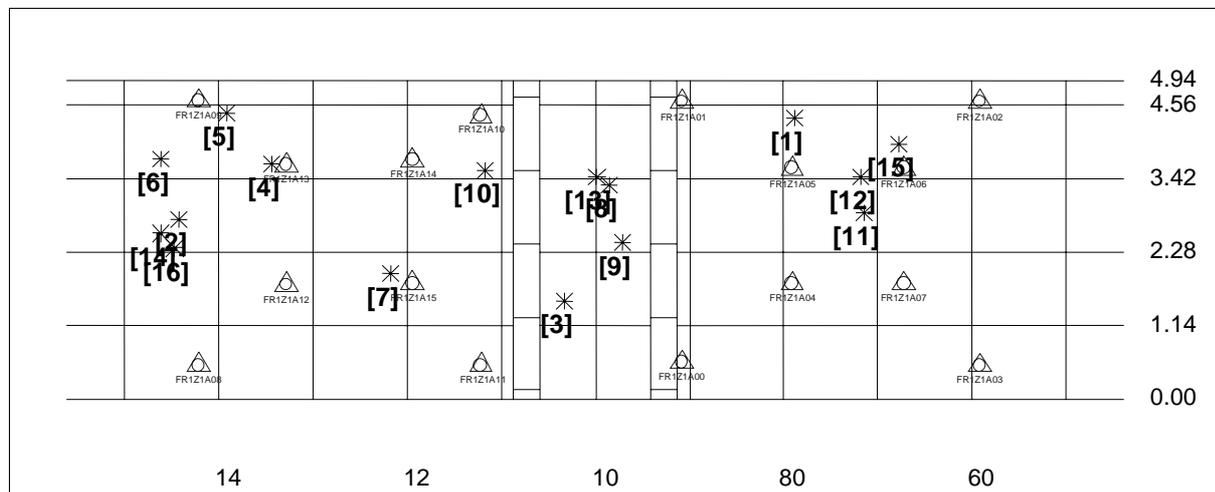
Sensor Layout and Location of Acoustic Cracking Events on Maeva Vessel Test No. 3, June 1999
